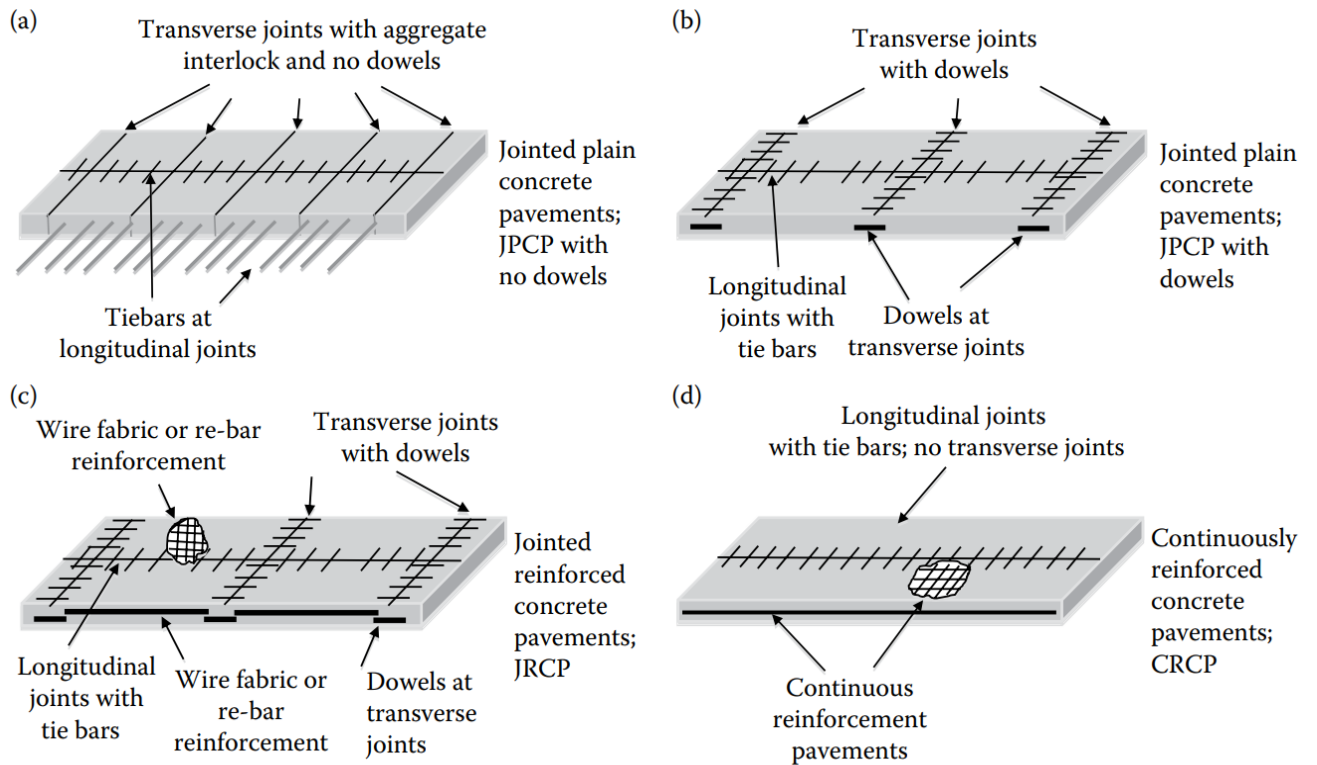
(a) Jointed Plain Concrete Pavement (JPCP) With Tie-Bars and No Dowels, (b) JPCP With Tie-Bars and Dowels, (c) Jointed Reinforced Concrete Pavements (JRCP) With Tie-Bars and Dowels, (d) Continuously Reinforced Concrete Pavements (CRCP) (Mallick and El-Korchi 2018)
